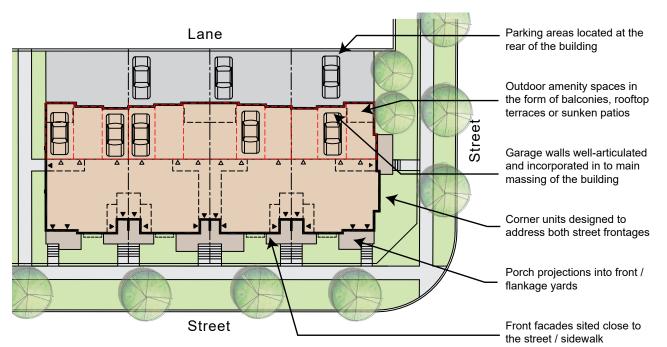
Conceptual Demonstration Site Plan For Stacked Townhouses With At-Grade Private Garages
